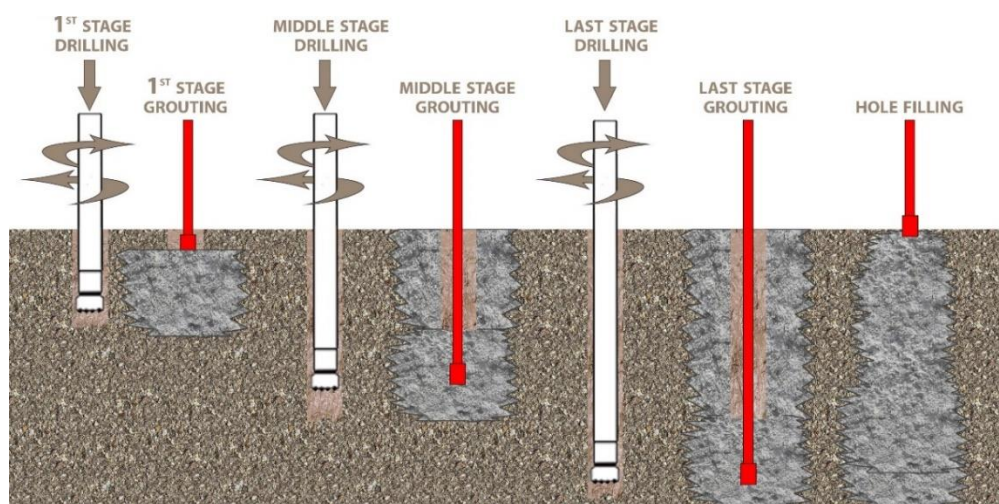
Downstage grouting with paker in rock formation(descending or down-stage).
